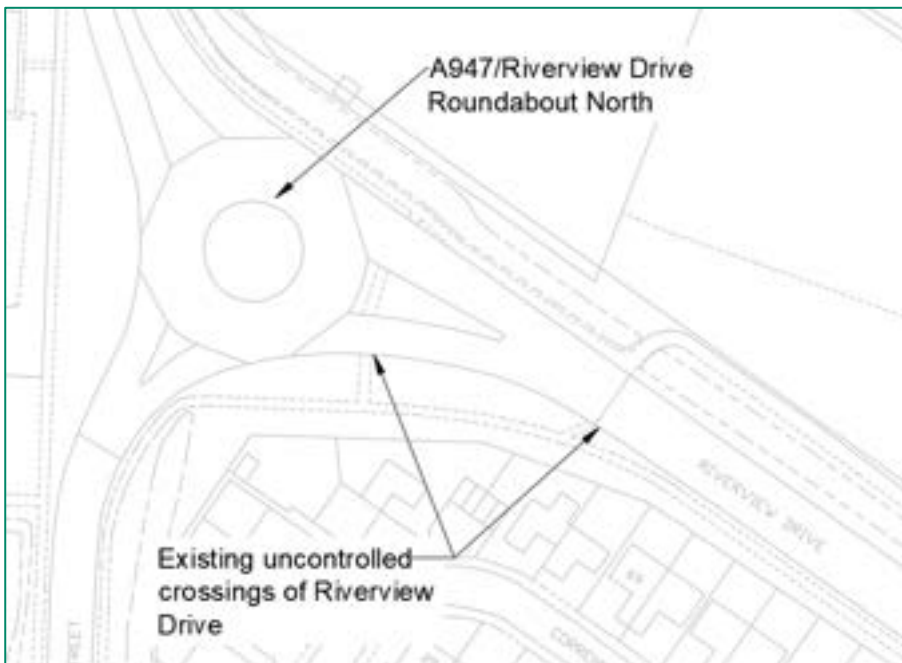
Existing Layout of A947/Riverview Drive Roundabout North
